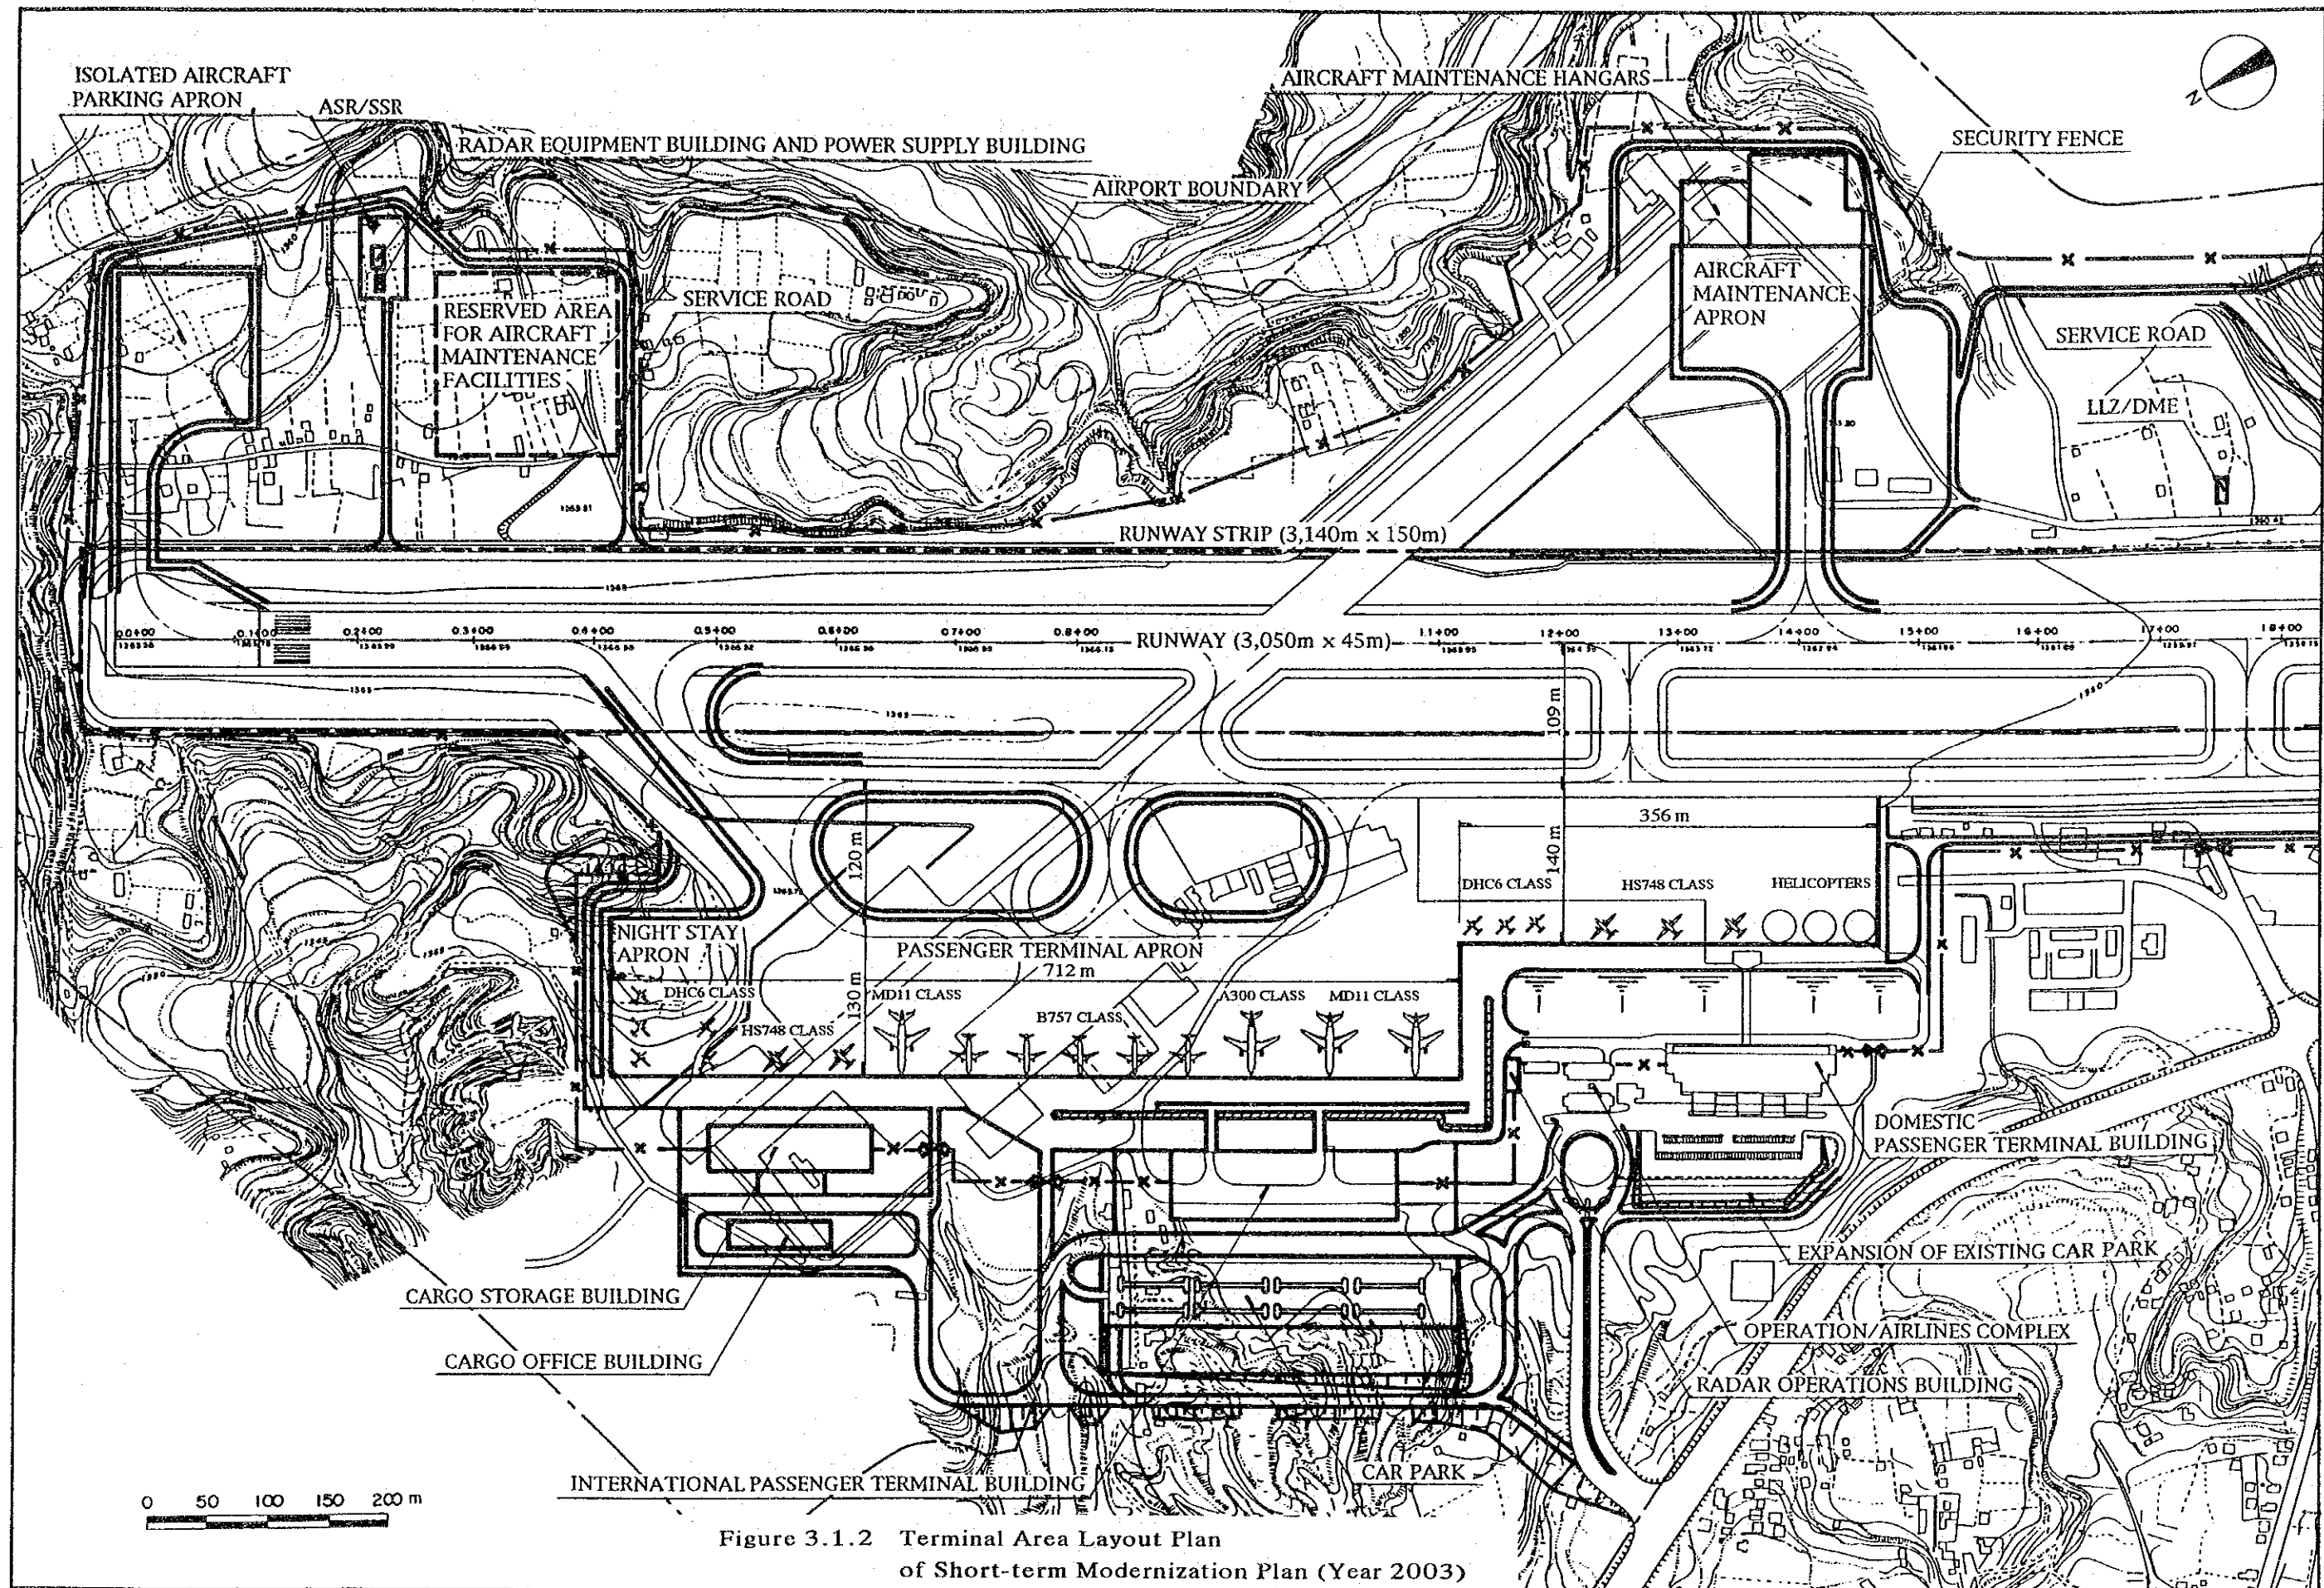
Terminal Area Layout Plan of Short-term Modernization Plan (Year 2003)
